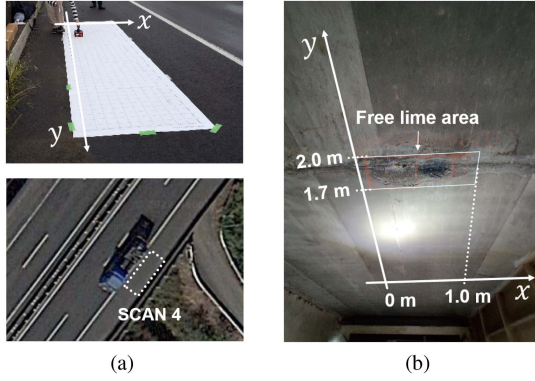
Measurement site at Shin-Tone Bridge and free-lime area at the bottom side of bridge, which would be caused by water leakage penetrated into the upper concrete floorboard (Case # 2). (a) Site. (b) Free-lime area.
